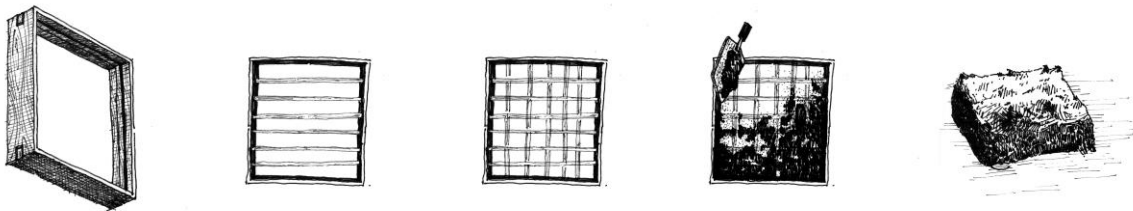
Sketch showing the steps needed to construct a clay brick using reeds as reinforcement elements. Courtesy: Ibrahim I.I Al Najar
